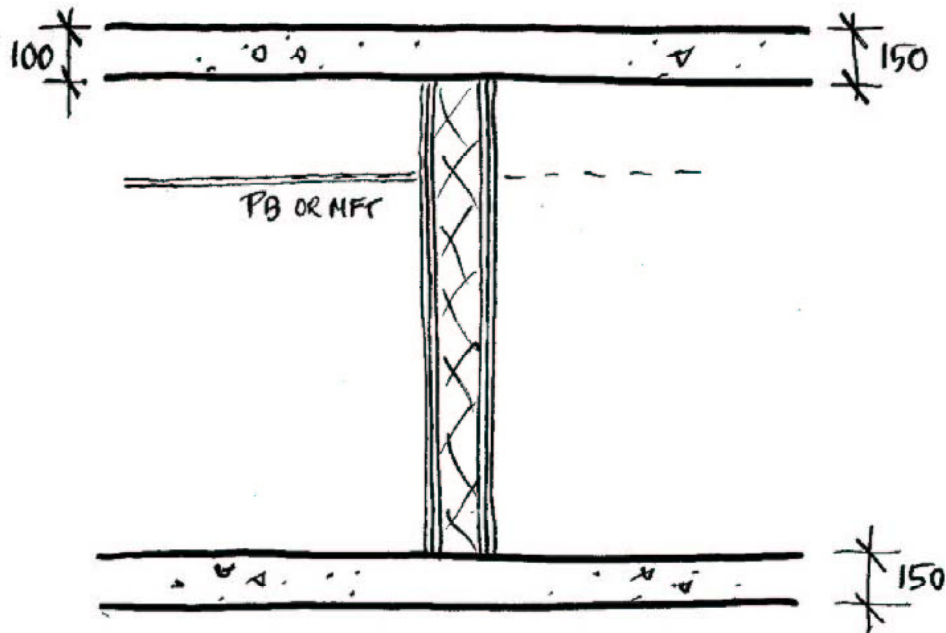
Grade 2 Construction Arrangement Options - Drywall
